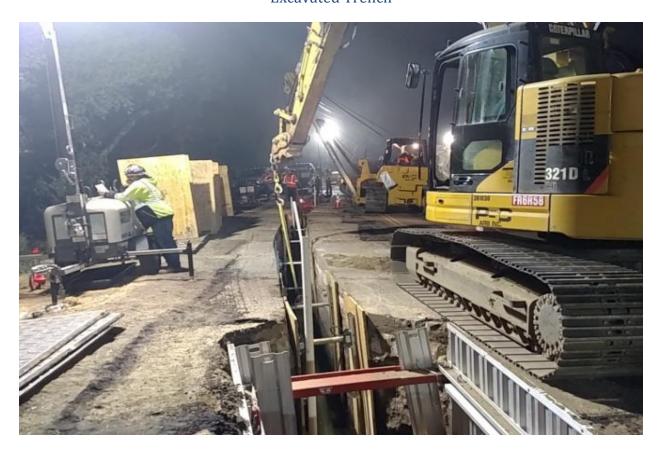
Section 7B - Shoring and Placement Equipment Used to Maintain Integrity of the Excavated Trench
